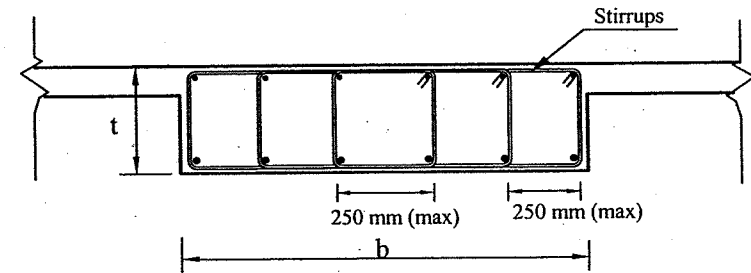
Stirrups arrangement for beams having  $b > t$  or  $b > 400$  mm
